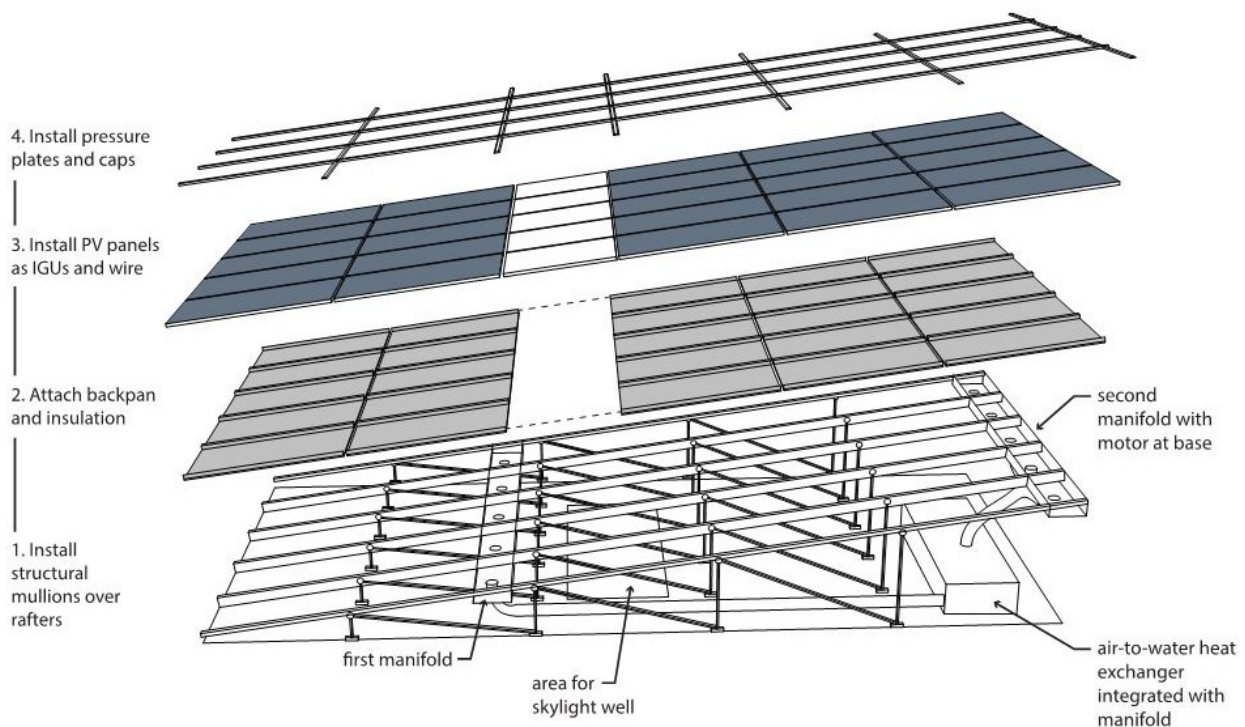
Exploded axonometric diagram of original BIPV/T system layers and materials. The final design had a continuous channel and one manifold at the back end.
